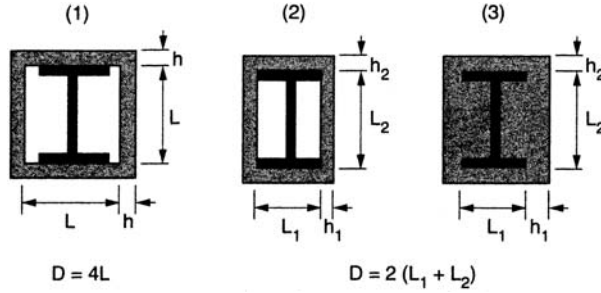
Concrete-protected structural steel columns. (1) square shape protection with a uniform thickness of concrete cover on all sides; (2) rectangular shape with varying thickness of concrete cover and (3) encasement having all re-entrant spaces filled with concrete.
